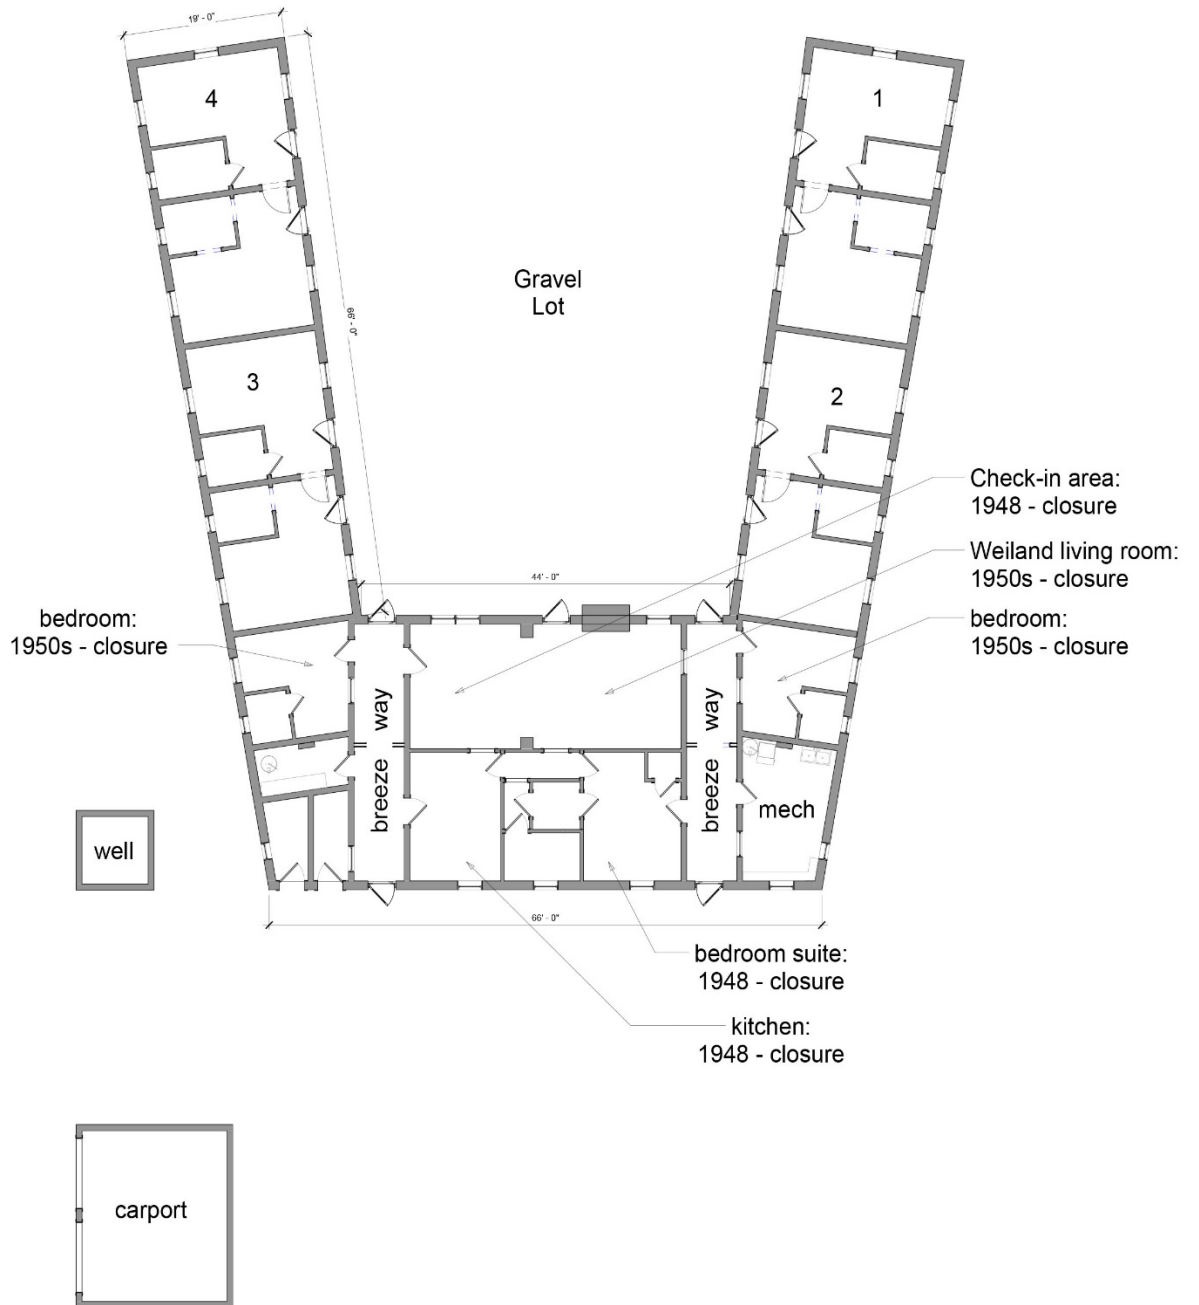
2021 Floor Plan. Drawn by Homegrown Studio.
